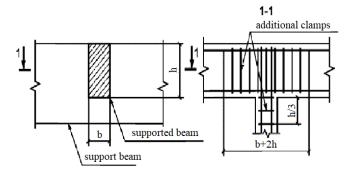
Placement of support reinforcement in the area of the two beam intersection [4]
